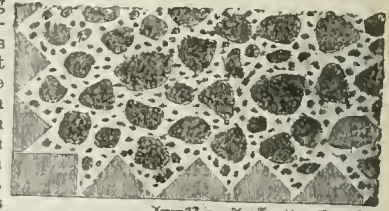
Section of concrete wall, showing the use of bricks merely as a facing
